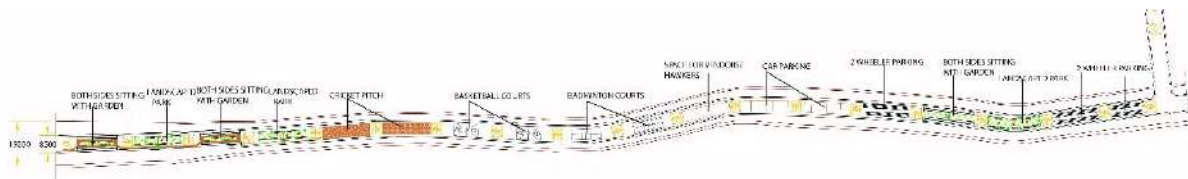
Plan showing the design of under-flyover spaces from Column No.8 till Column No.24 on Site(Author).
